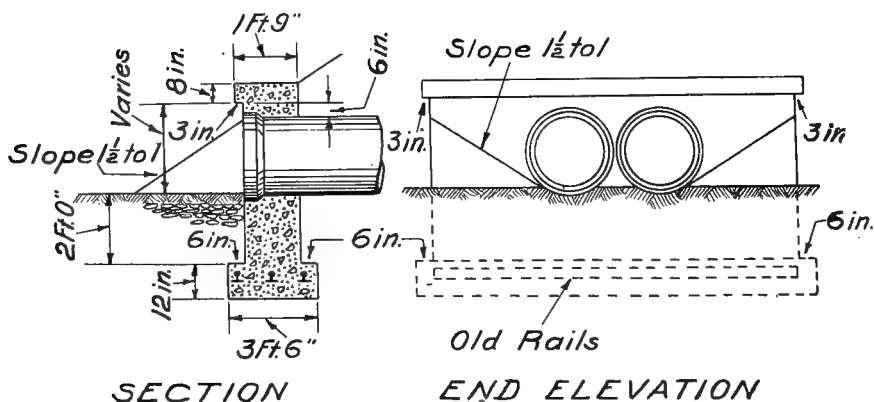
STANDARD PIPE CULVERT, STRAIGHT TYPE, N. Y. C. & H. R. R. R.
